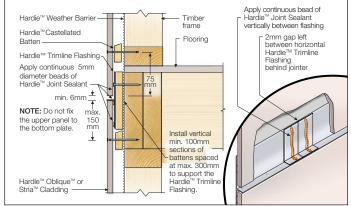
UPPER FLOOR JUNCTION INTERNAL CORNER DETAILS
